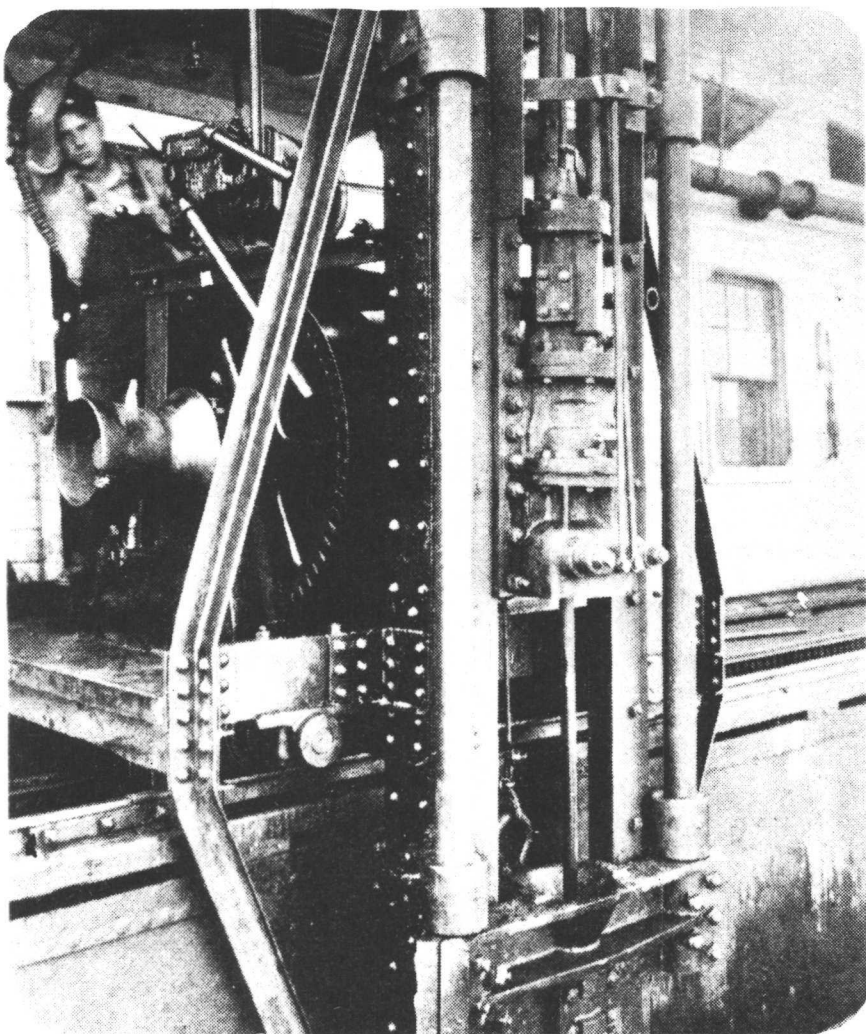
A modern hammer drill on the U. S. Engineer drill boat "No 426" working in Rock Island Rapids.
